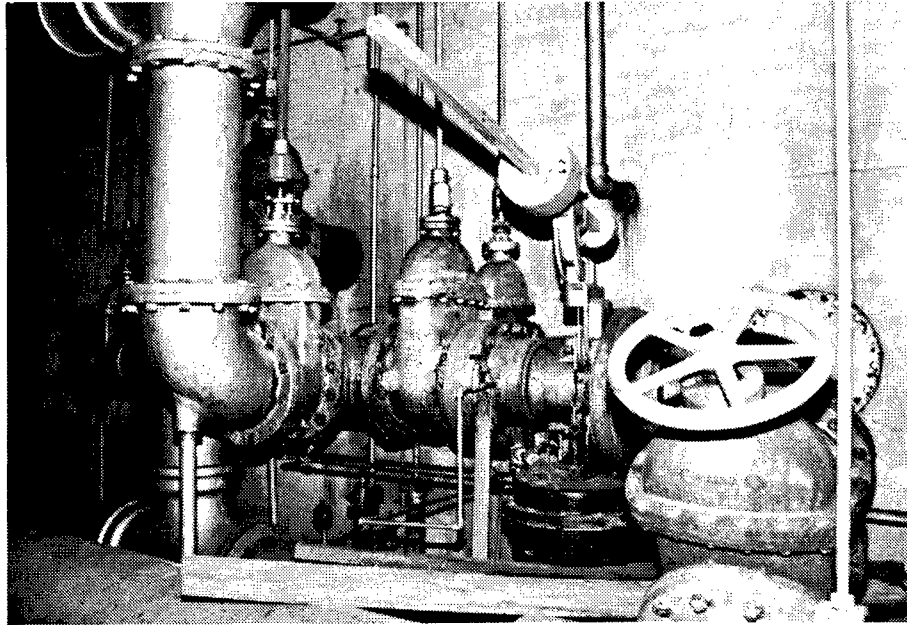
Building A9: Filler and Valve Room equipment, consisting of valves and counter weights, located in the basement of the Water and Sewage Section of the Water Filtration Facility.
